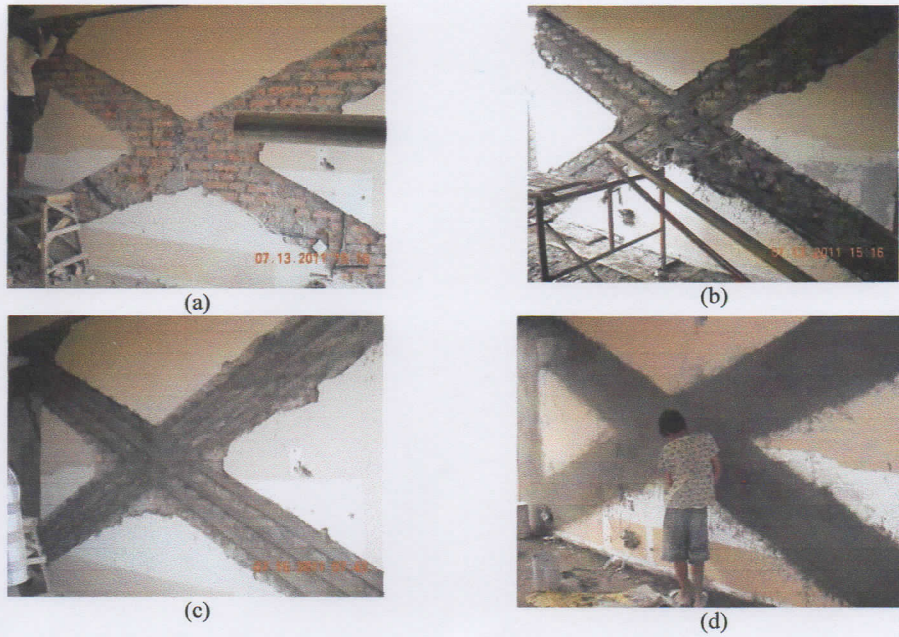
Retrofitting of masonry walls between rooms using diagonal wire mesh strips on both sides of the wall: peeling off wall plaster (a); thin bed mortar for wire mesh (b); wire mesh installation (c); re-plastering (d).
